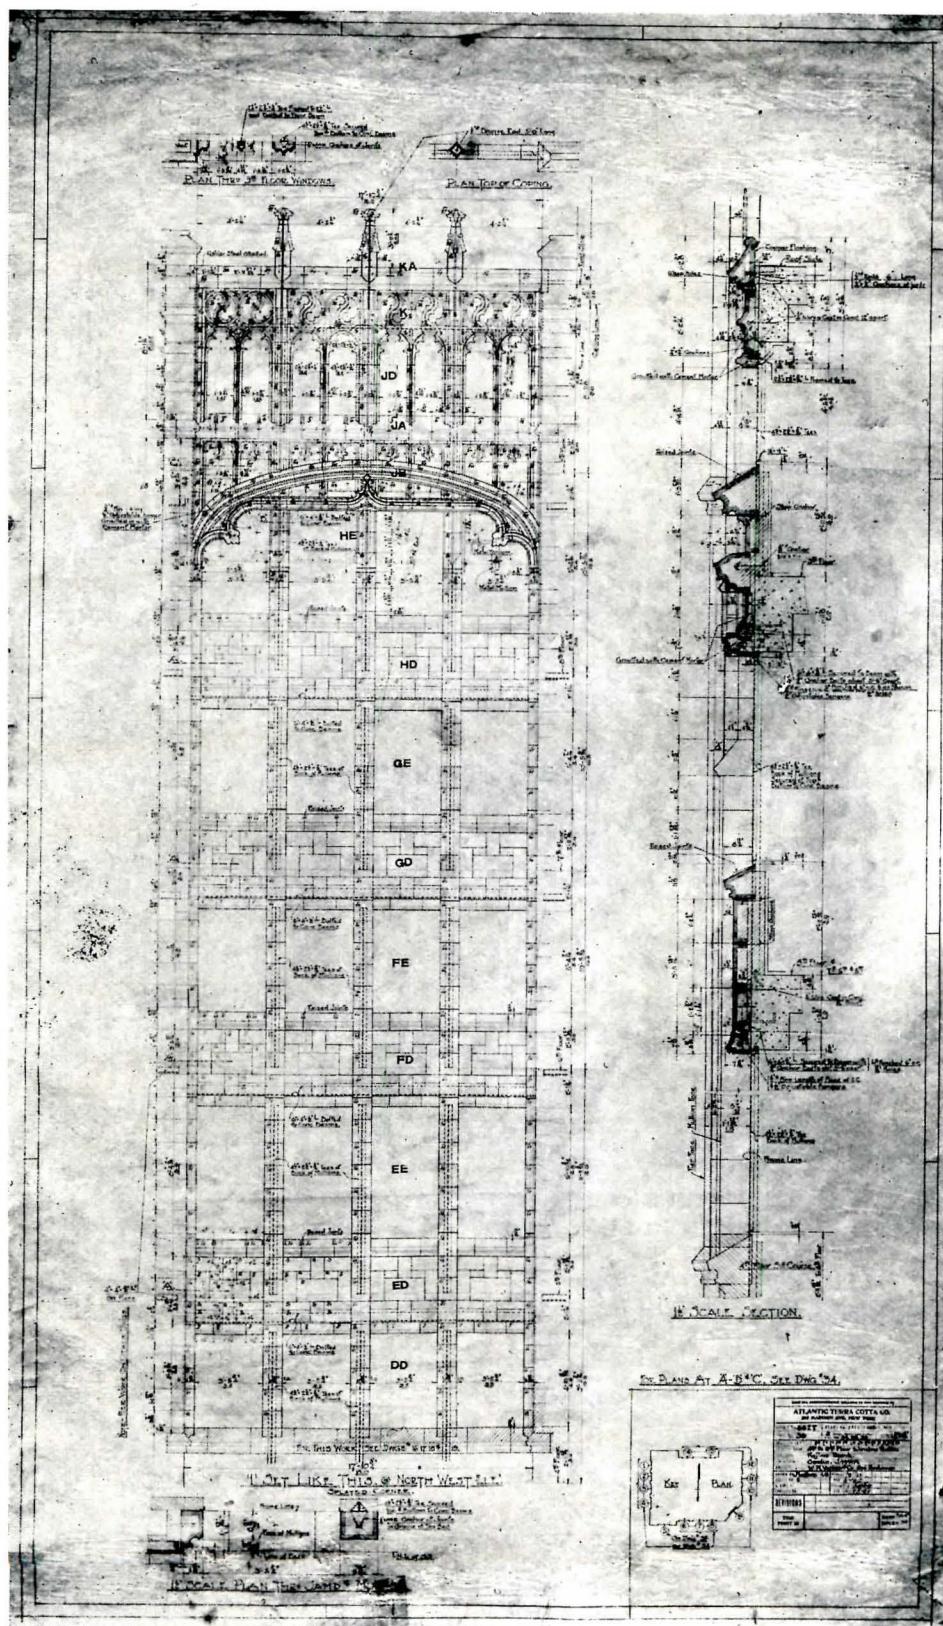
Shop Drawing of Part of a Terra Cotta Façade of a Banking Building in Japan. W. M. Vorices & Co., Omi Hachiman, Architects.
